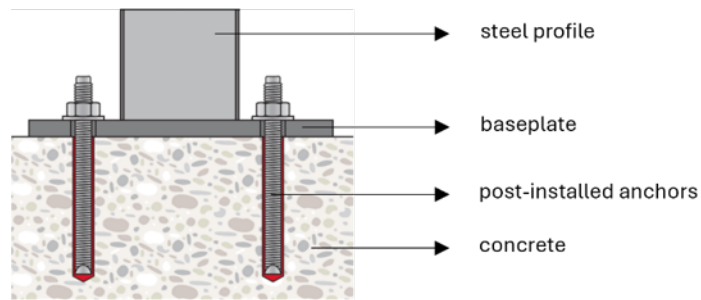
Schematic arrangement of the components of a steel to concrete connection
